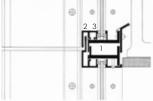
[above] Horizontal section through a mullion of the curtain wall
